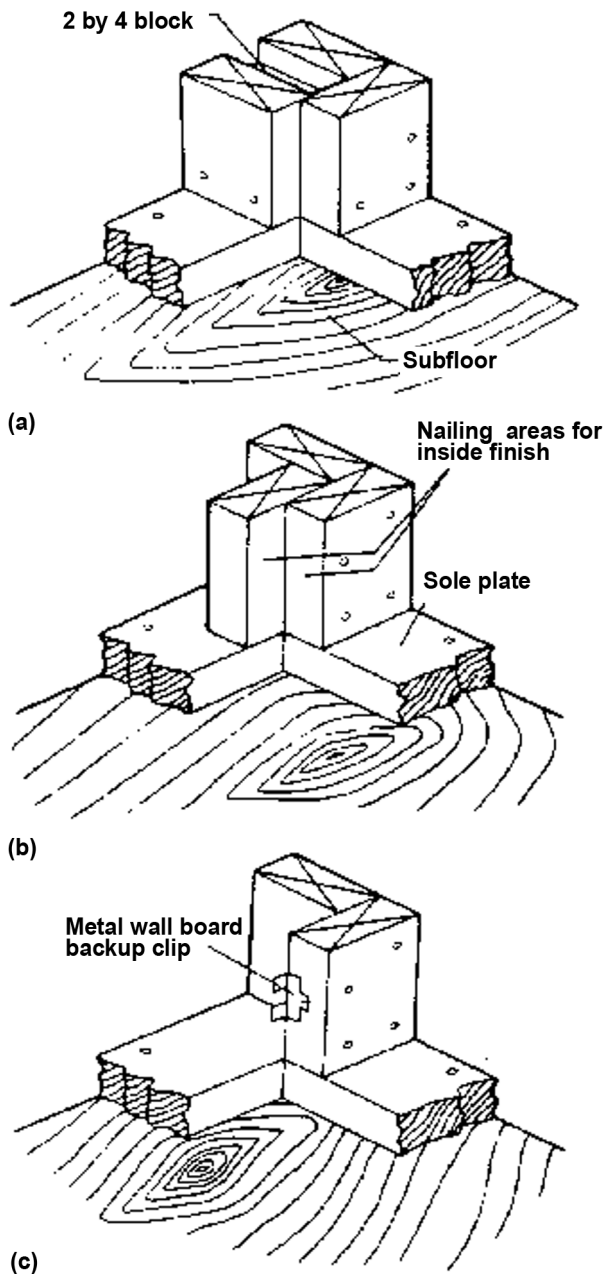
Corner details for wood stud walls that provide support for interior sheathing: (a) traditional three-stud corner with blocking; (b) three-stud corner without blocking; (c) two-stud corner with wallboard backup clips.
